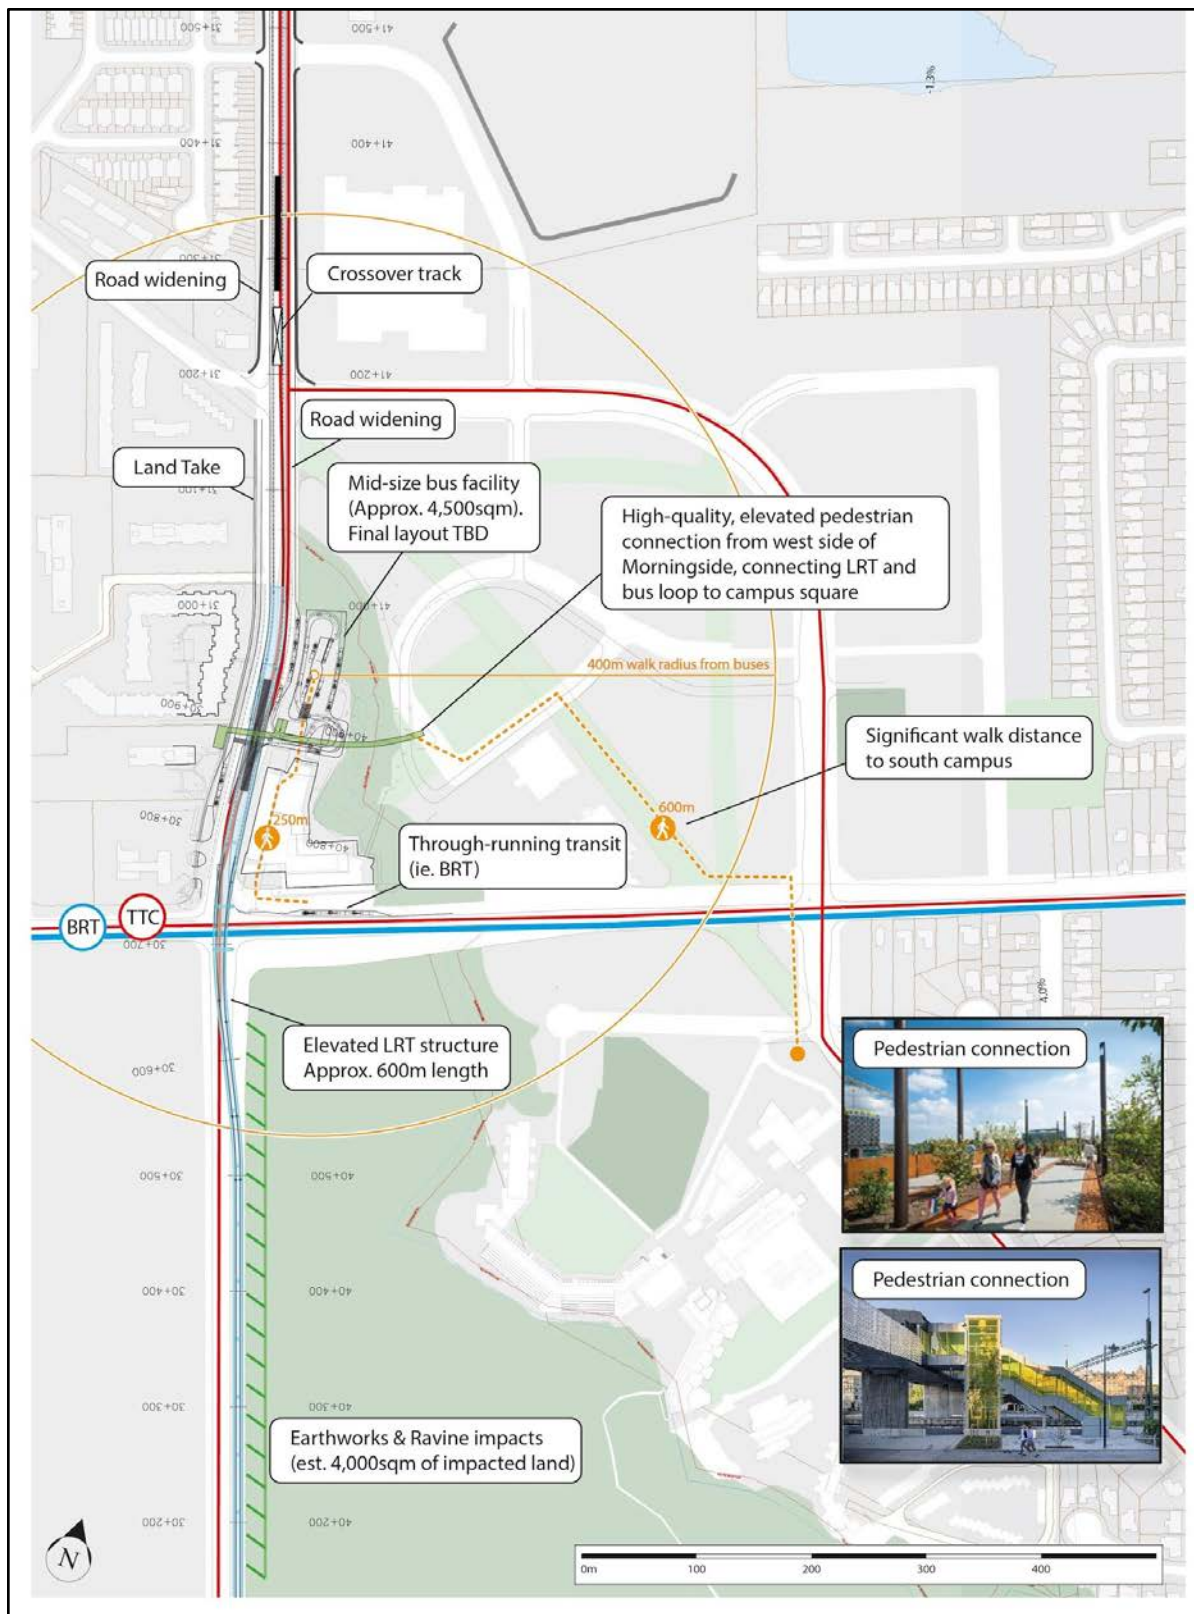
Elevated Morningside Concept (Street and Block pattern as proposed by the UTSC Secondary Plan application)
